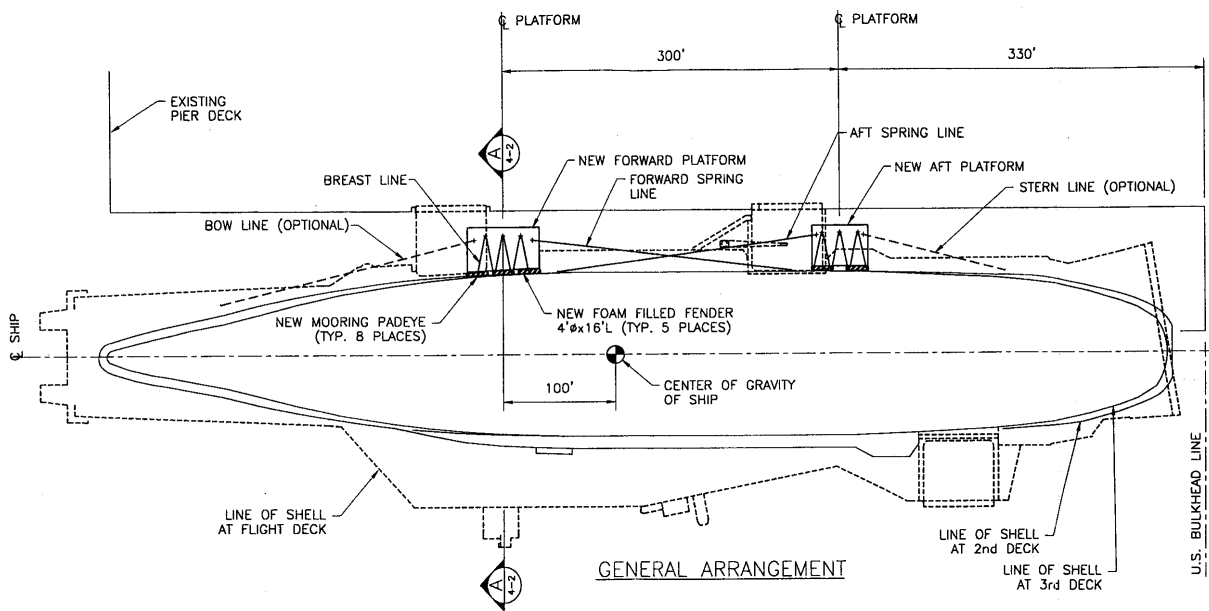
Project site plan showing the existing pier 11A with the proposed breasting platforms and the proposed mooring of the U.S.S. Midway.
